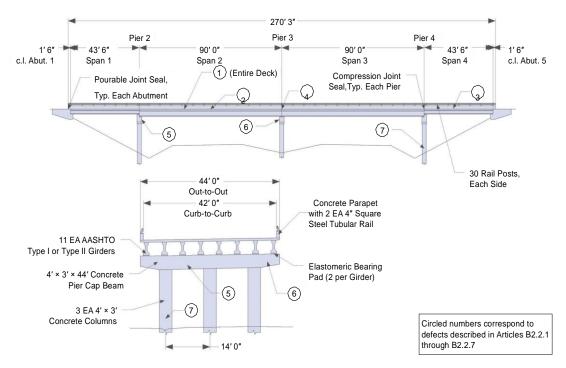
Elevation and Typical Section of Bridge for Prestressed Concrete Girder Bridge Example
